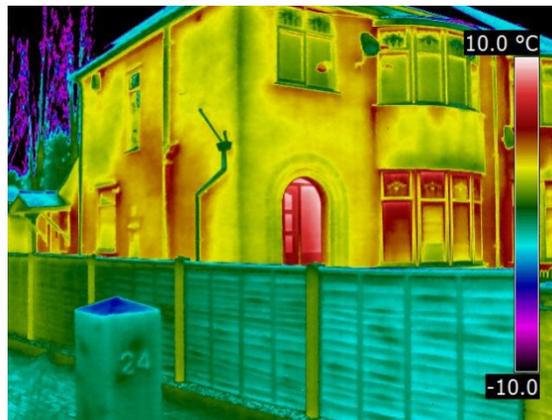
Rendered solid wall dwelling, with internal insulation installed in bay window. Bay window appears patchy suggesting loss of performance in the internal wall insulation.
